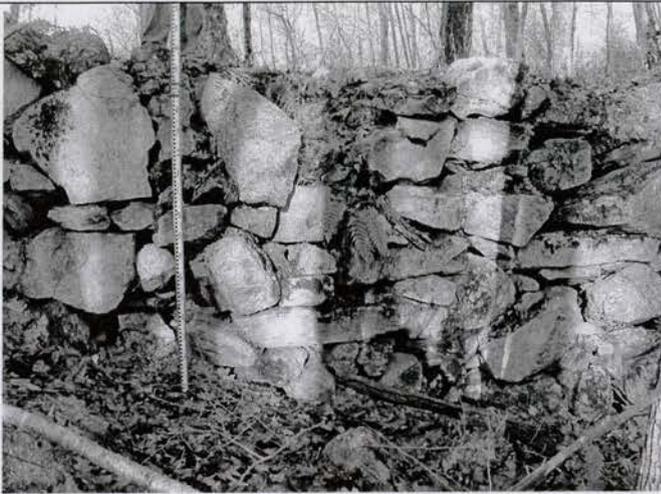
19-12-1-2005 London Bridge E wall, North to South, Section 14 View W
